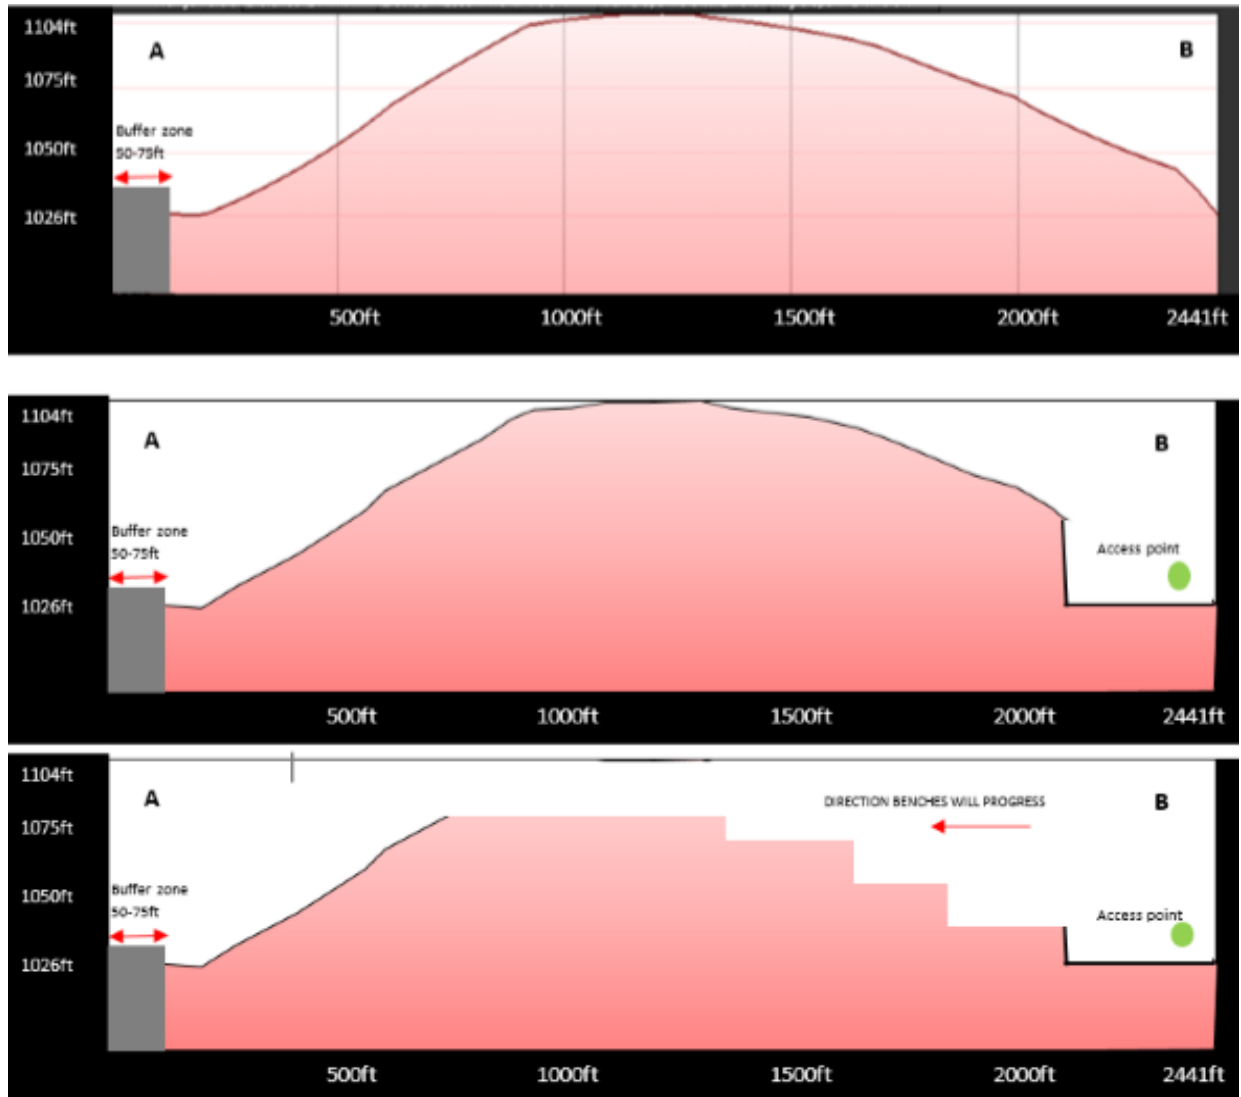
Cross-sectional bench profile of Harbour Head as mining progresses.
